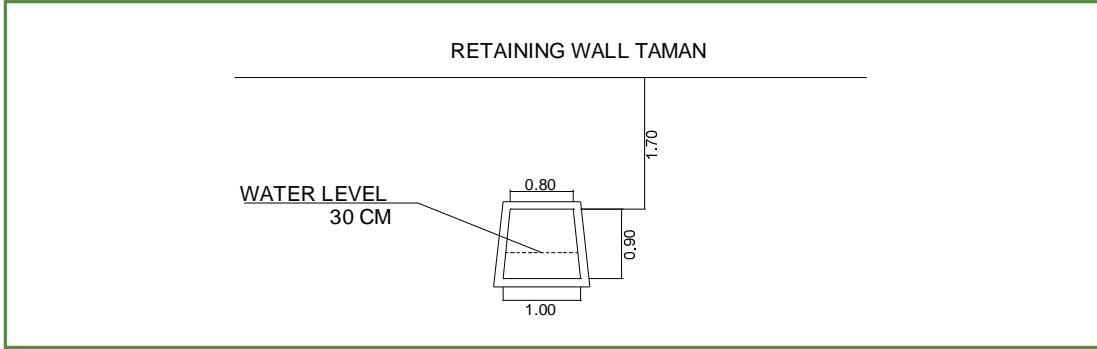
DETAIL OF BOX CULVERT-4 (TAMBORA AREA-1)
